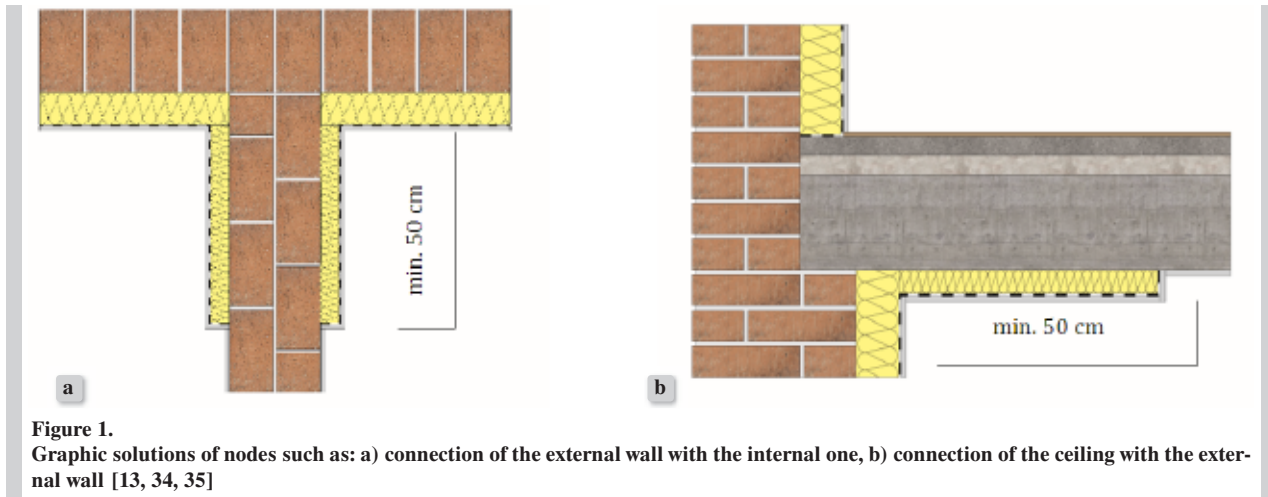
Graphic solutions of nodes such as: a) connection of the external wall with the internal one, b) connection of the ceiling with the external wall [13, 34, 35]
